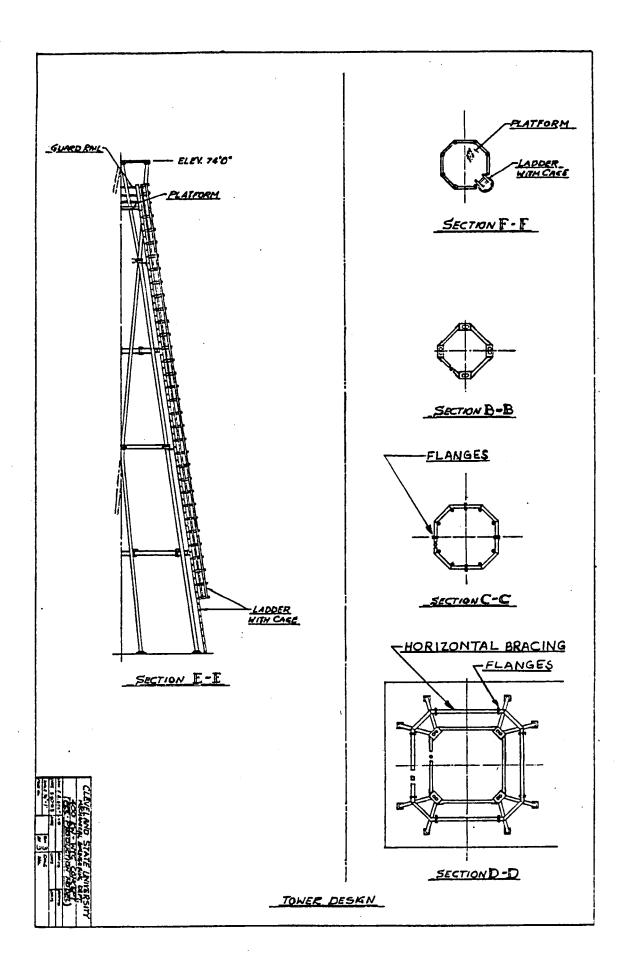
TOWER DESIGN-SECTION VIEWS
